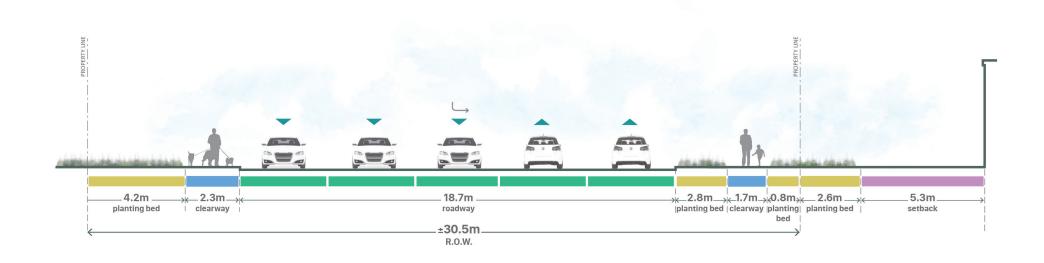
Section AA - Lawrence Avenue East - Existing Condition
